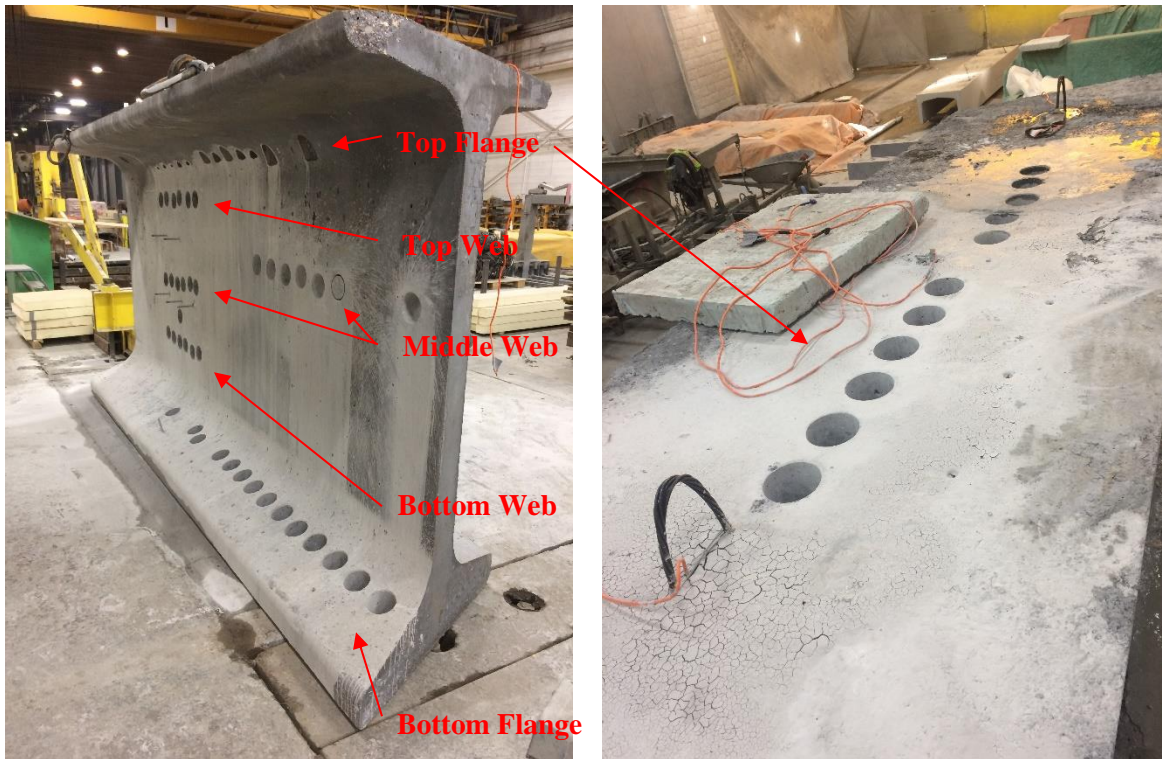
Left: Photo of Core Locations of G3. Right: Photo of Top of Section Showing Top Flange Cores
